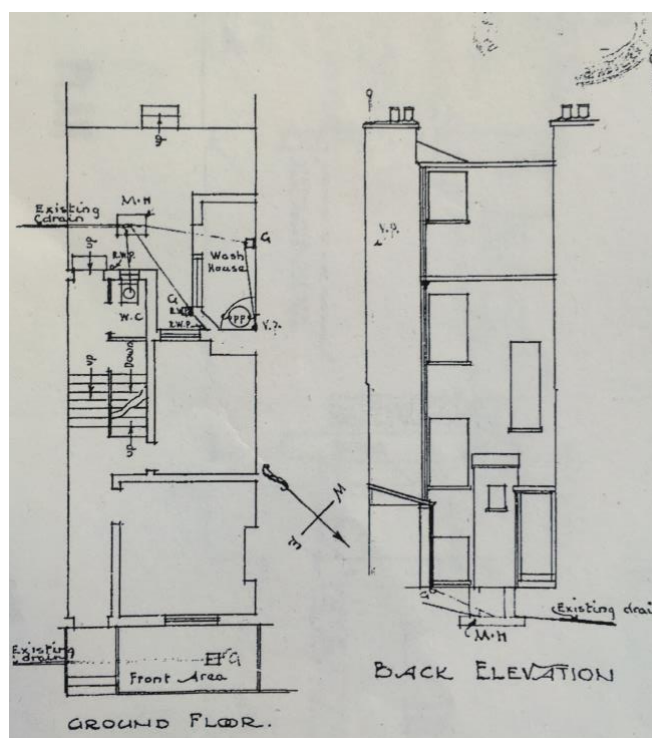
Drainage plan, 1930 (Camden Local Studies and Archives Centre)
